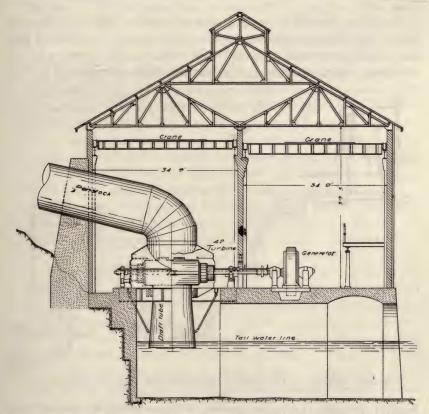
Plant of Hudson Water Power Co. Spier's Falls Plant. Double Horizontal Turbines in Steel Penstock. Central Discharge (Engineering Record). (See page 569.)
